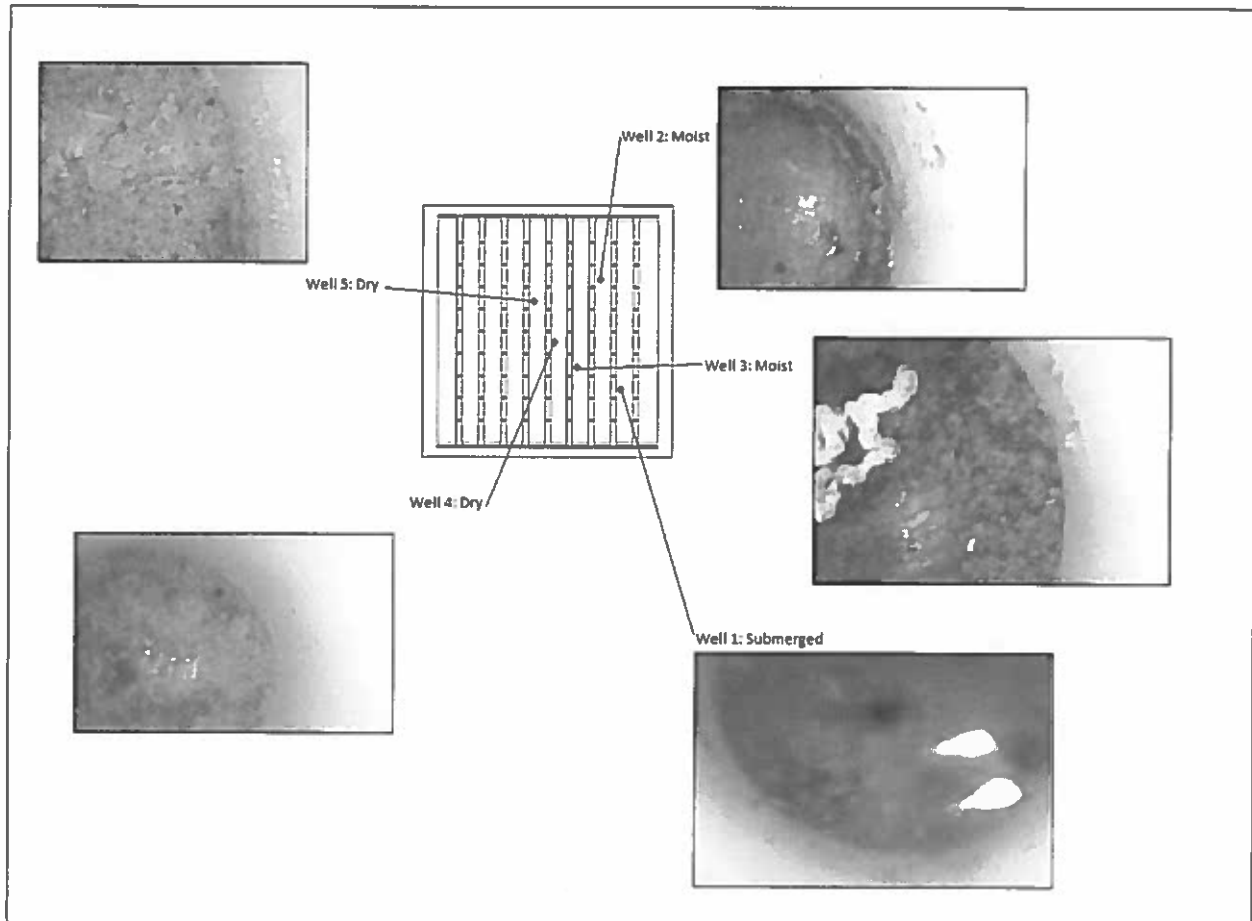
Well Inspection Images Using a Bore Scope
